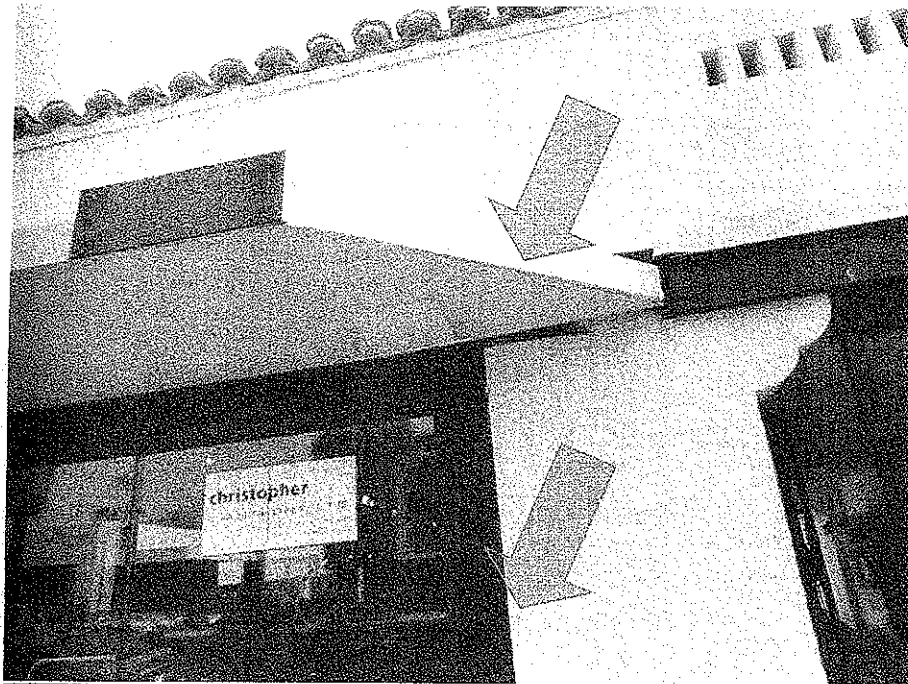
West exterior Elevation. Water leak occurred at the top of the window wall and at the side of black steel column joint at the masonry wall.
